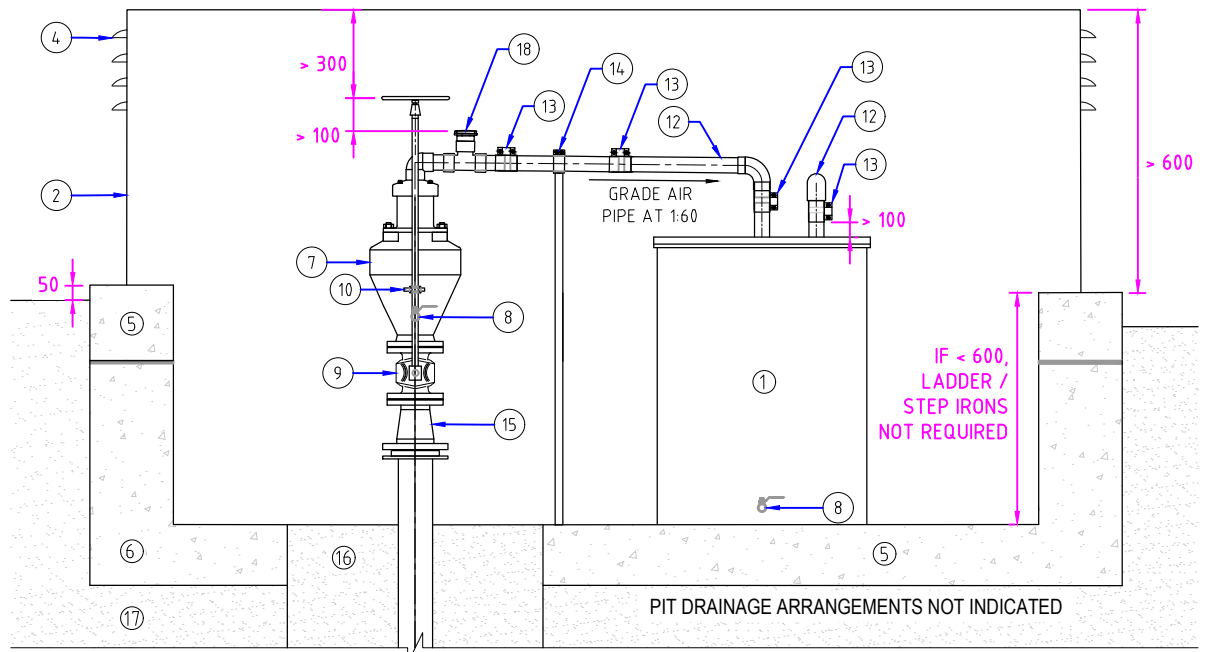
PARTIALLY ABOVE GROUND AIR VALVE AND CARBON CANISTER ASSEMBLY (SECTION B)
